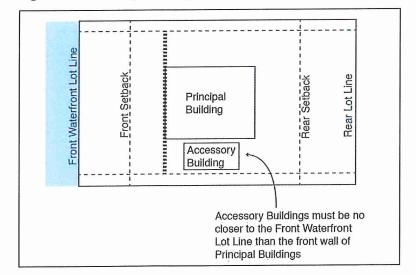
Accessory Building Front Setback Illustration (RM-3 front waterfront)
